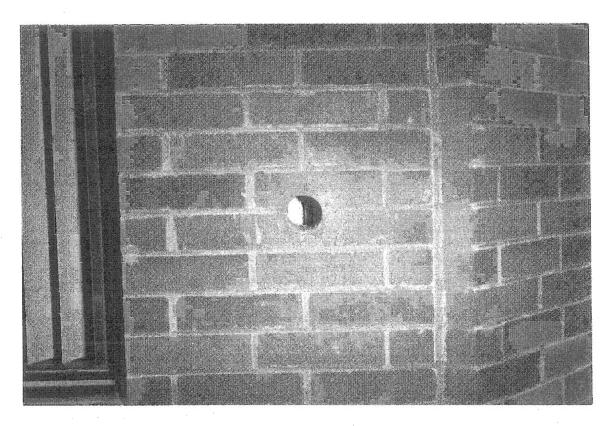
View of Steel Stud Offset in 65mm dia. Core
